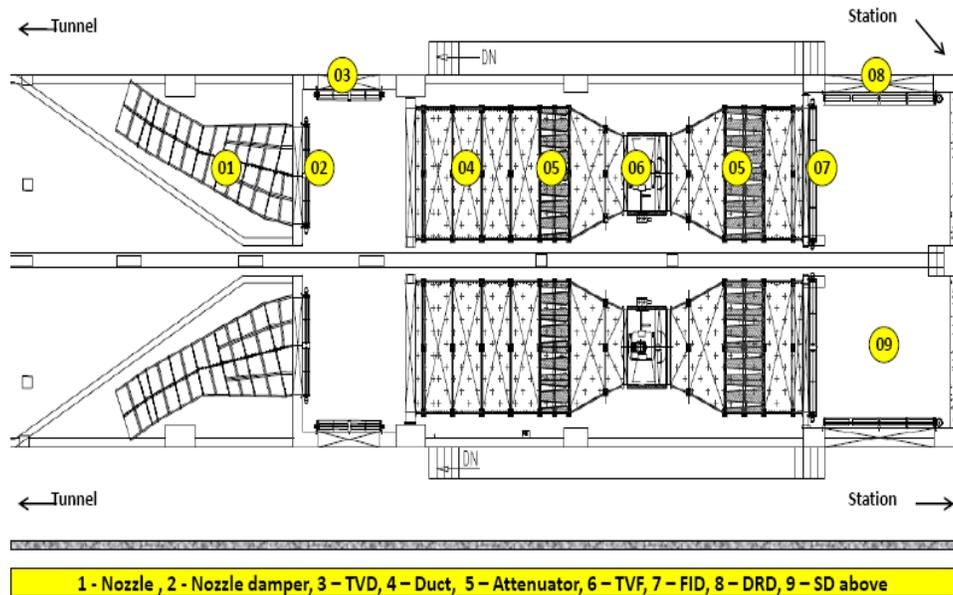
Typical schematic of the TVS Plant Room at Platform Level
